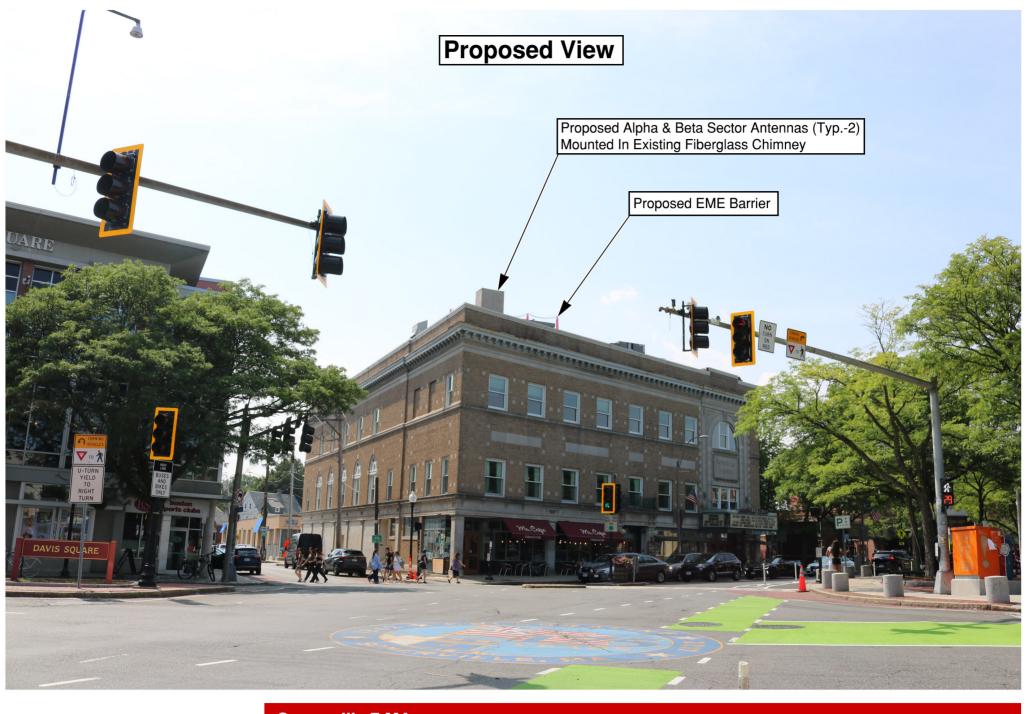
B View Facing Northwest From Highland Avenue (Page 6 of 8)
